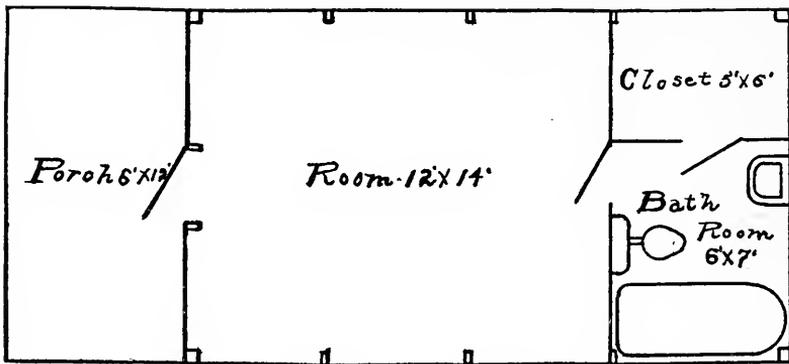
Floor plan of Pottenger Sanatorium Bungalow.
